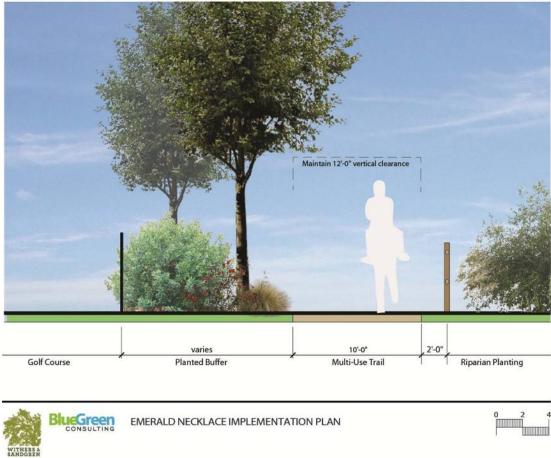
Proposed multi-use trail improvements for Section 2 of the project area.
